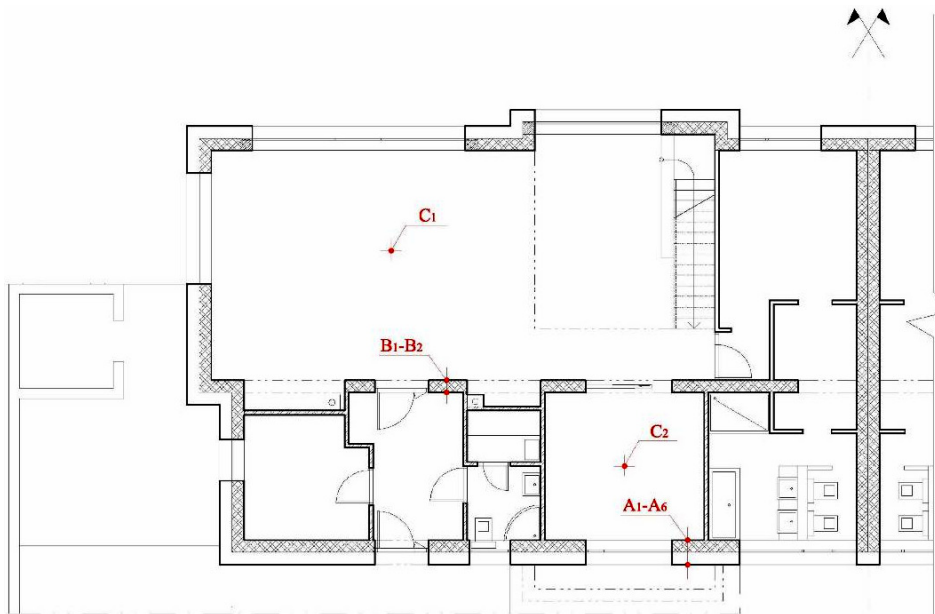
Schematic illustration of sensors deployment in floor plan of the first overhead floor of the house in the village Lorinčik
